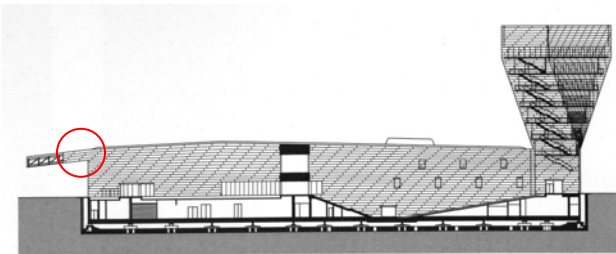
Section of the de Young. A slight bend can be seen at the left side of the image where the canopy meets the building mass. (Image source: Rob Gregory, *Key Contemporary Buildings: Plans, Sections, and Elevations*, 173.) Circle highlighting bend in canopy by author.
